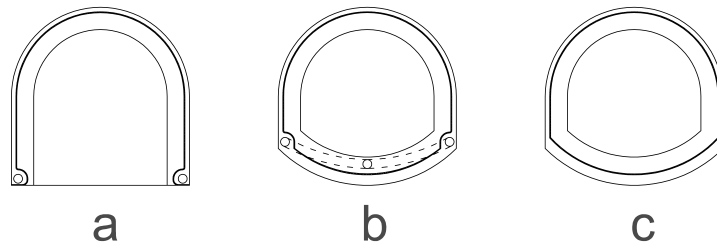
Waterproofing approaches: (a) drained only crown, (b) drained full-round, (c) undrained full-round
